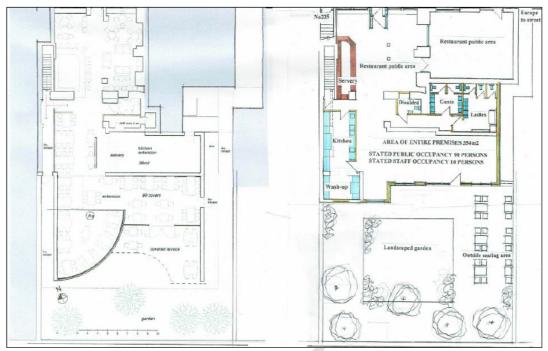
floor layouts of the approved scheme (left) and the current scheme (right). External tables shown are illustrative
